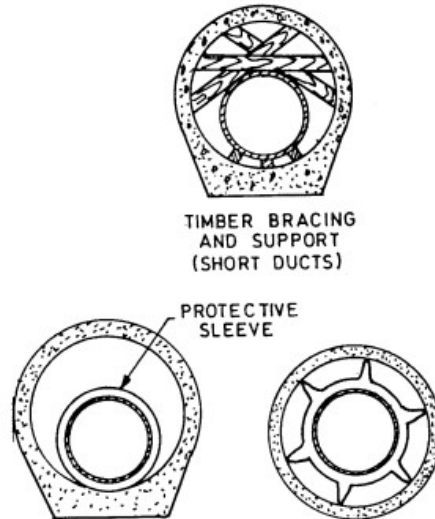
Typical Details of Pipes Installed in Small Ducts
